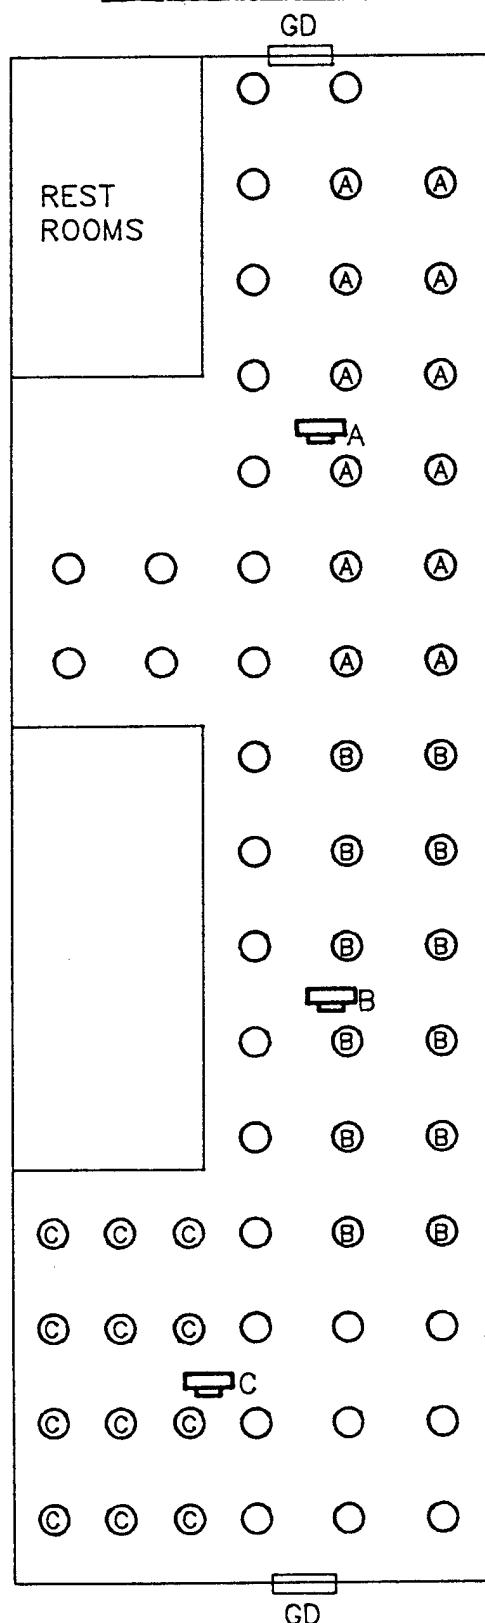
PHOTOCELL CONTROL LAYOUT - BUILDING 94
